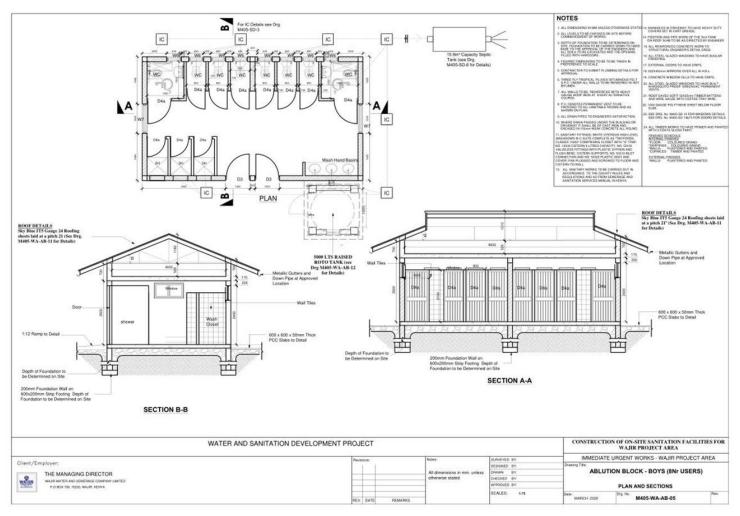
Layout plan of Proposed Boy's Ablution Block
